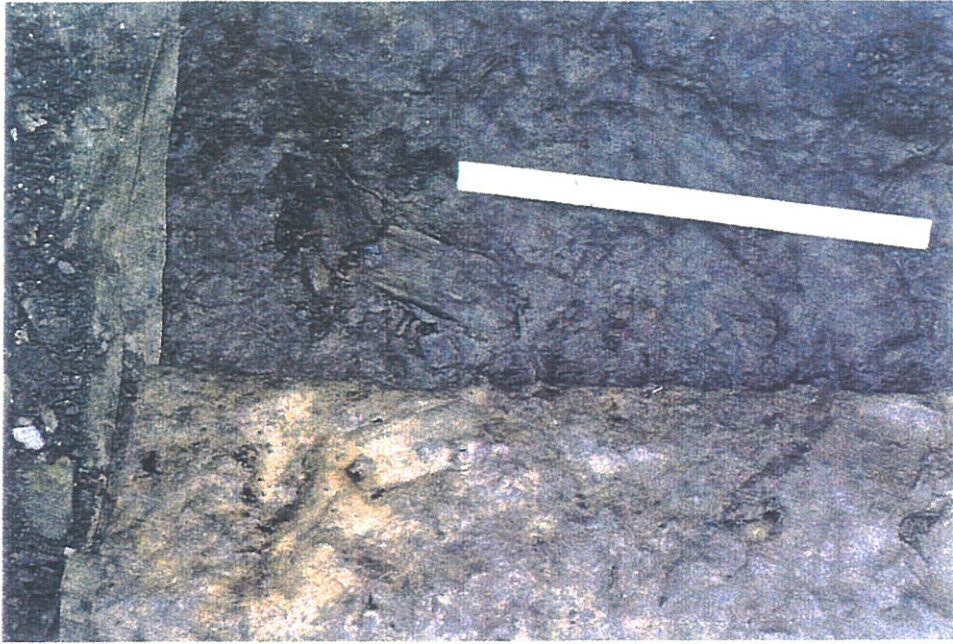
Geotextile separator folded back to expose the subgrade.
